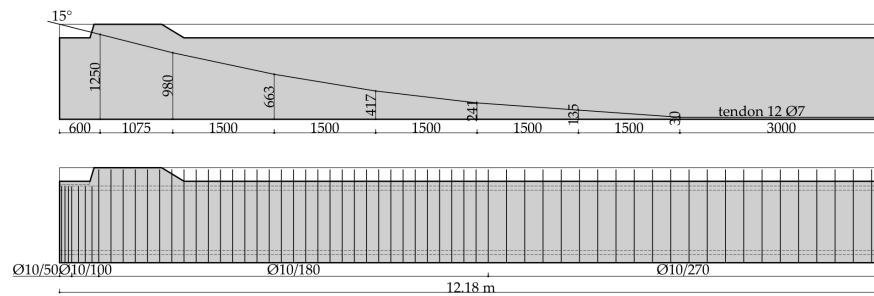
Geometry and reinforcement details of the prestressed beam set 1.
